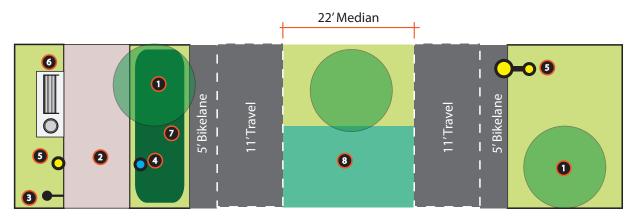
Conner Creek Greenway (St. Jean) Plan-Section: Full Level of Development
